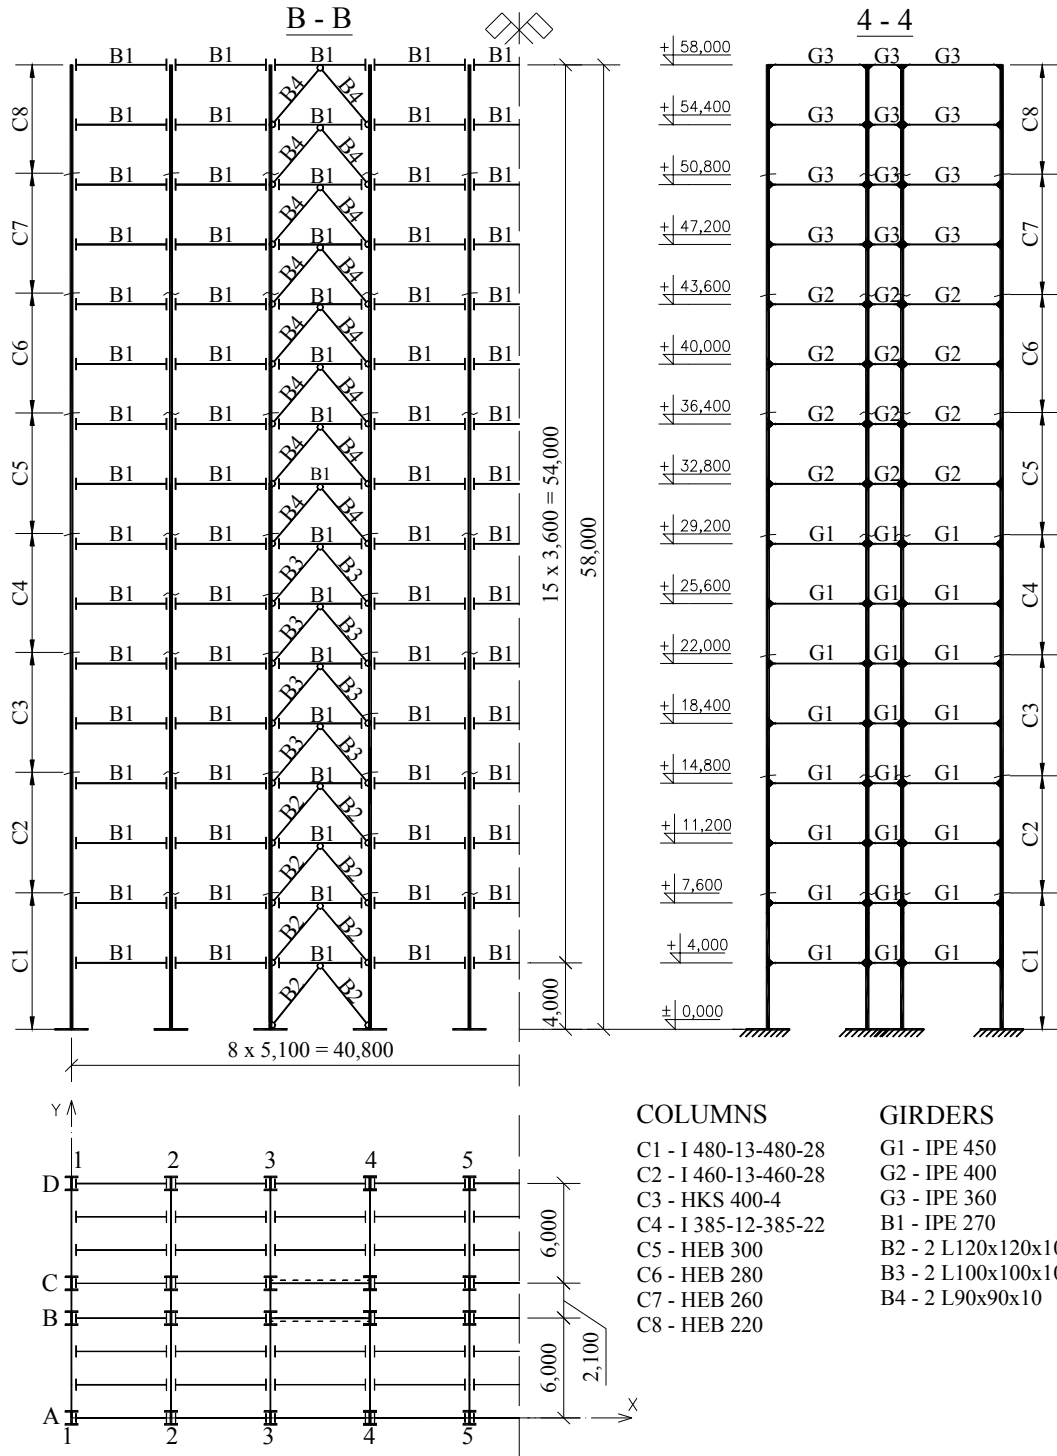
Analysed Skeletal Framed Steel Structure – Building B3 (16-Story)
